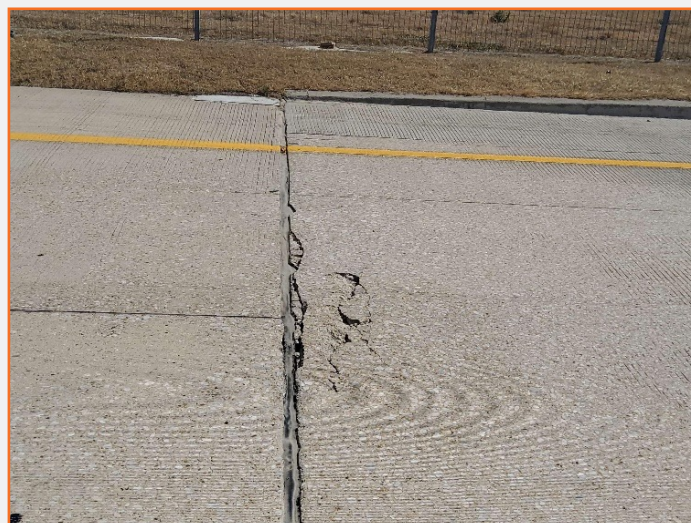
360T pavement spall SB exit ramp to Webb Lynn Rd.
